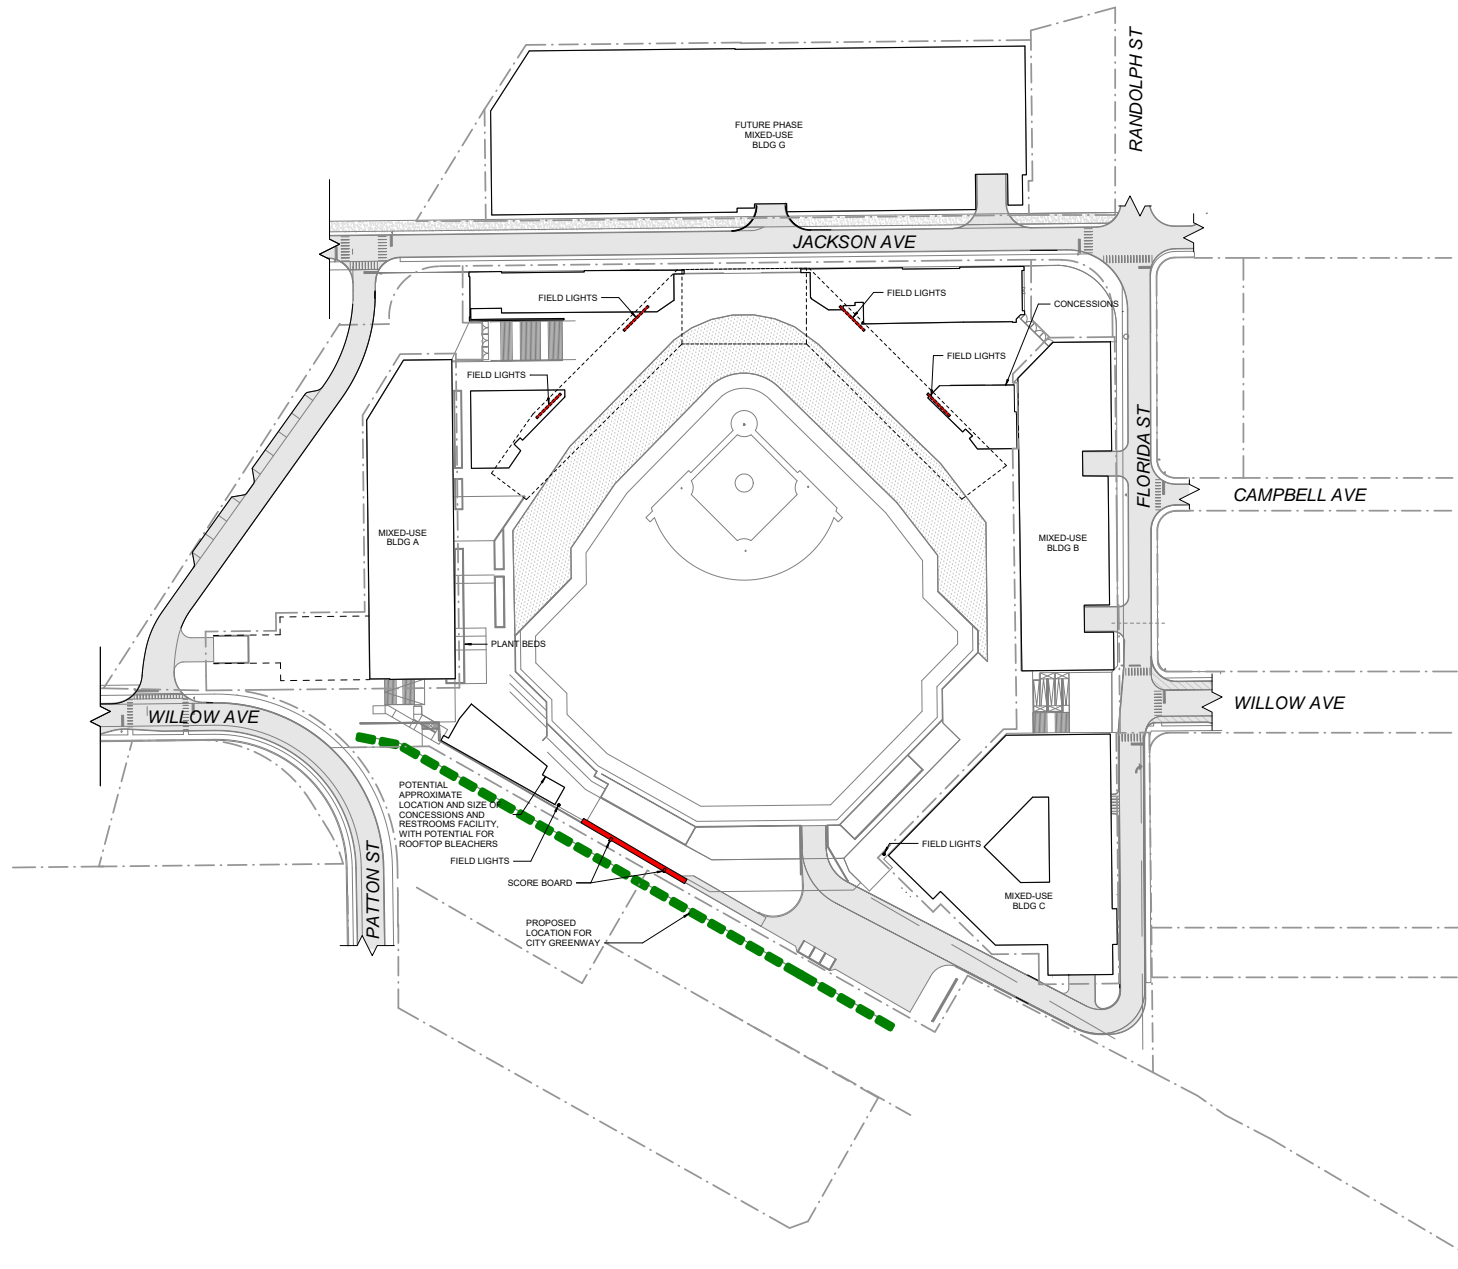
STADIUM LIGHTING INTENT CONCEPT PLAN
